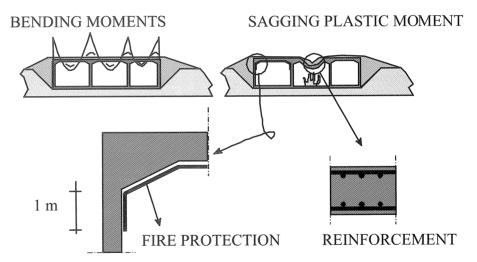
Protection of roofs and upper parts of the walls of immersed tunnels to limit the probability of structural collapse of the roofs in the case of fire.
